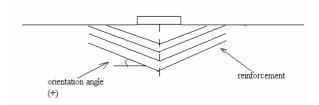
Foundation on soil reinforced with inclined reinforcement layer
